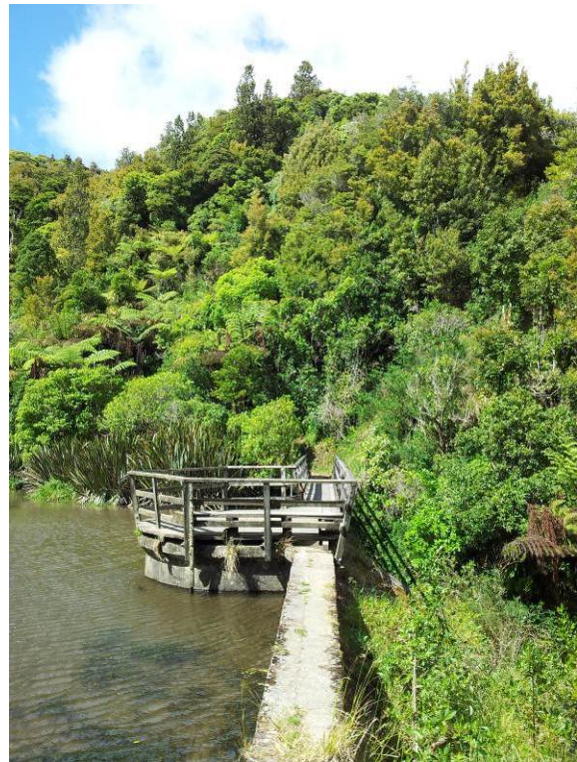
Korokoro Dam crest and left abutment. Note vegetation on dam downstream face and groin.
